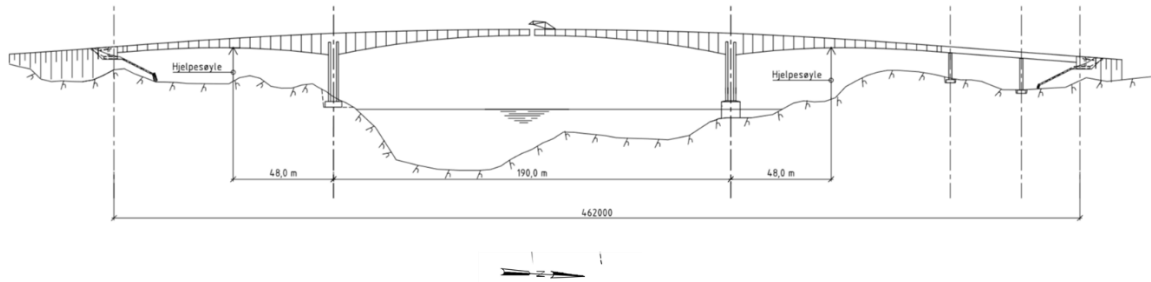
Bridge with dimensions, before connecting to adjacent cantilever.
